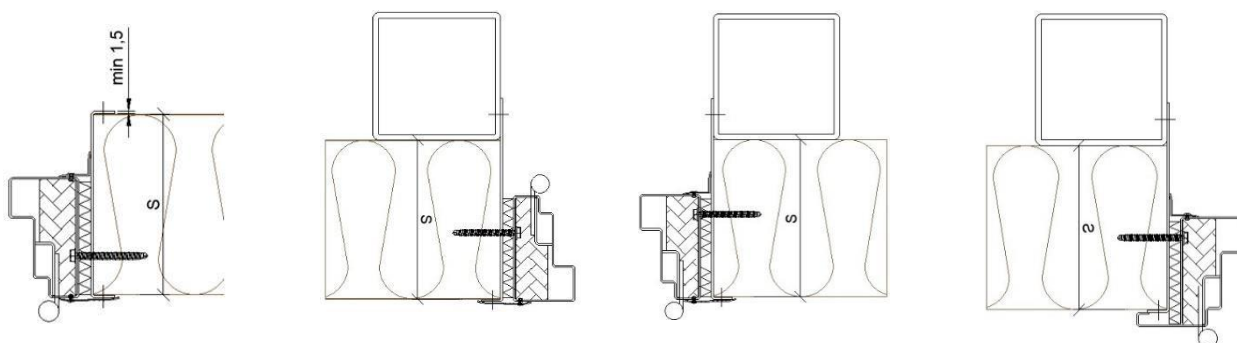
Installation of the door into EI60 or better sandwich panel wall. (SMU101/201)
